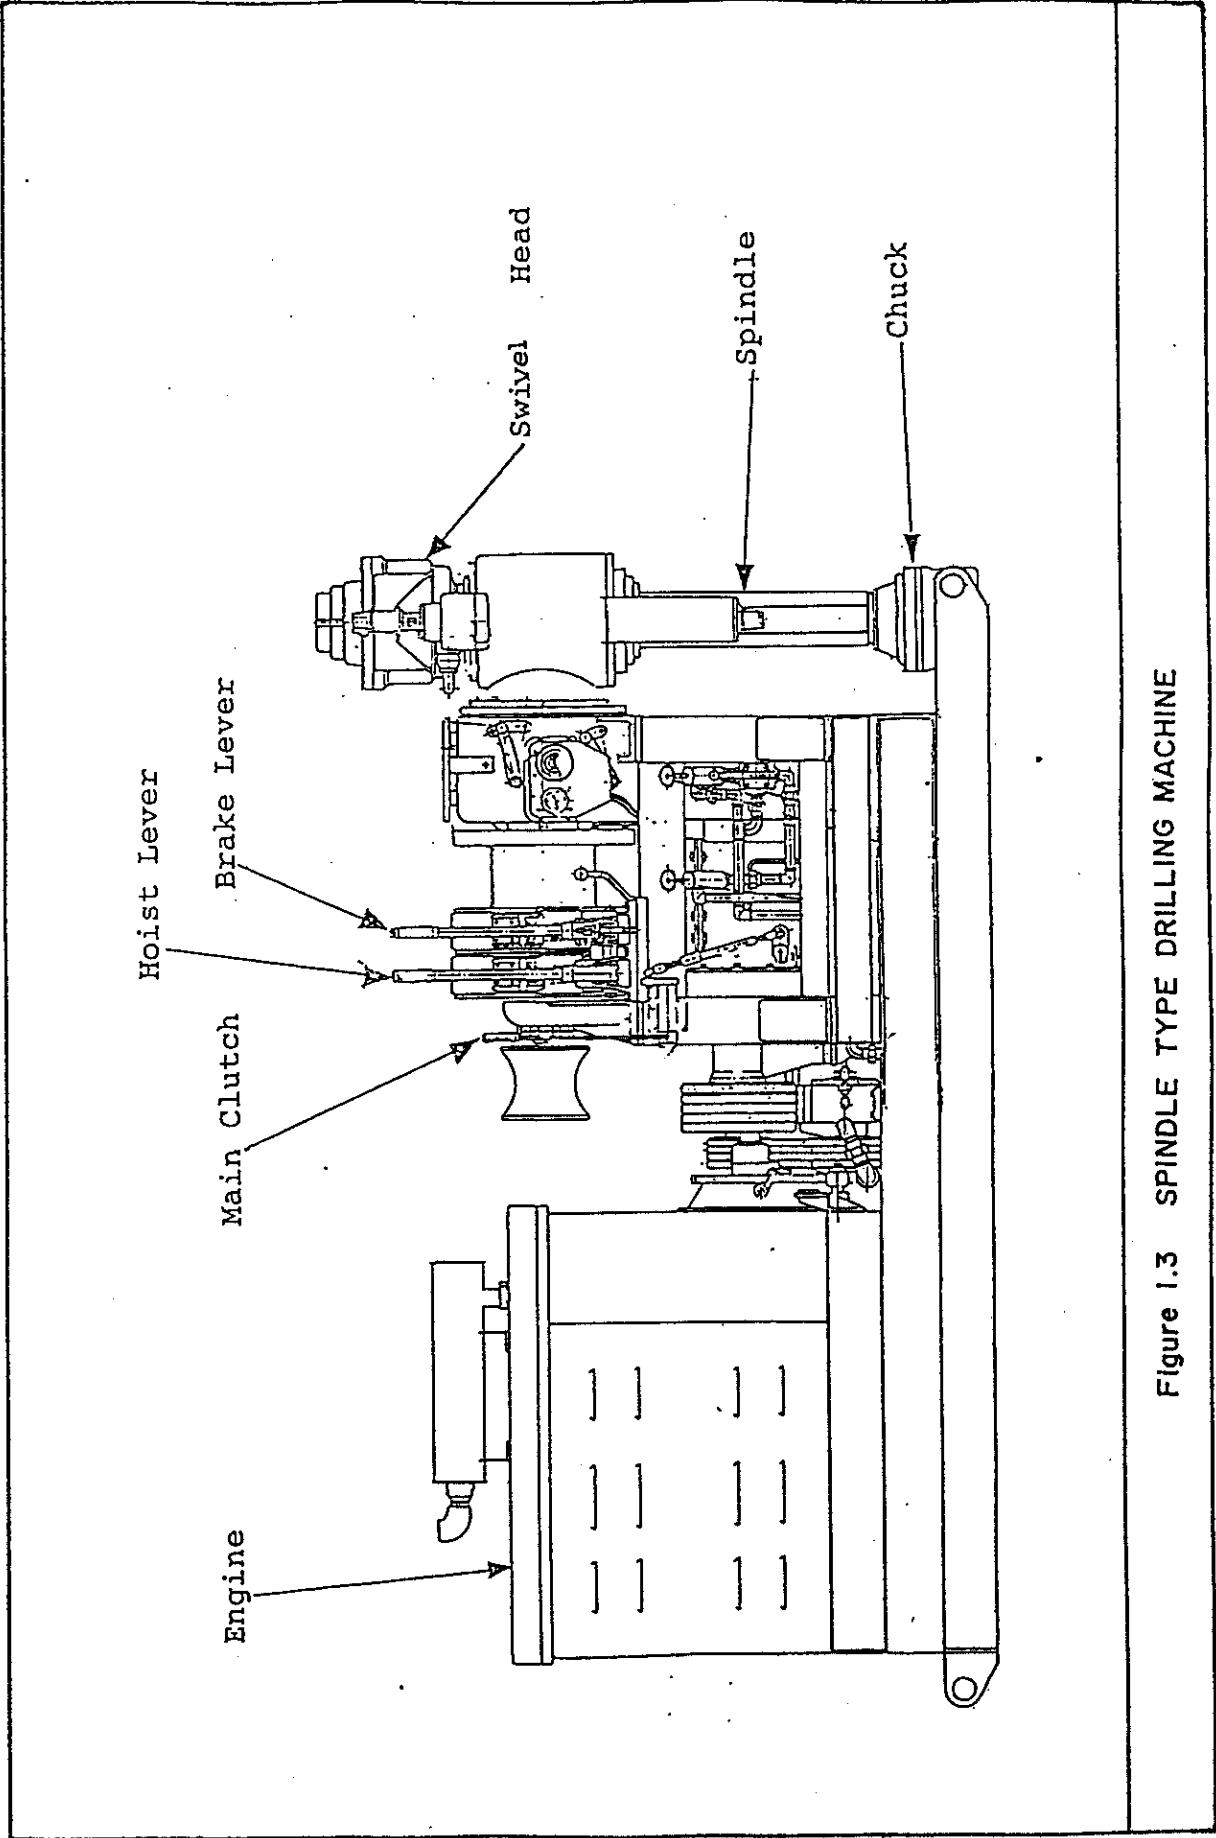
SPINDLE TYPE DRILLING MACHINE
